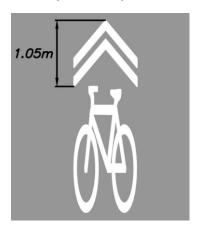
Sharrow Pavement Marking (Source: BCAT, 2019)
